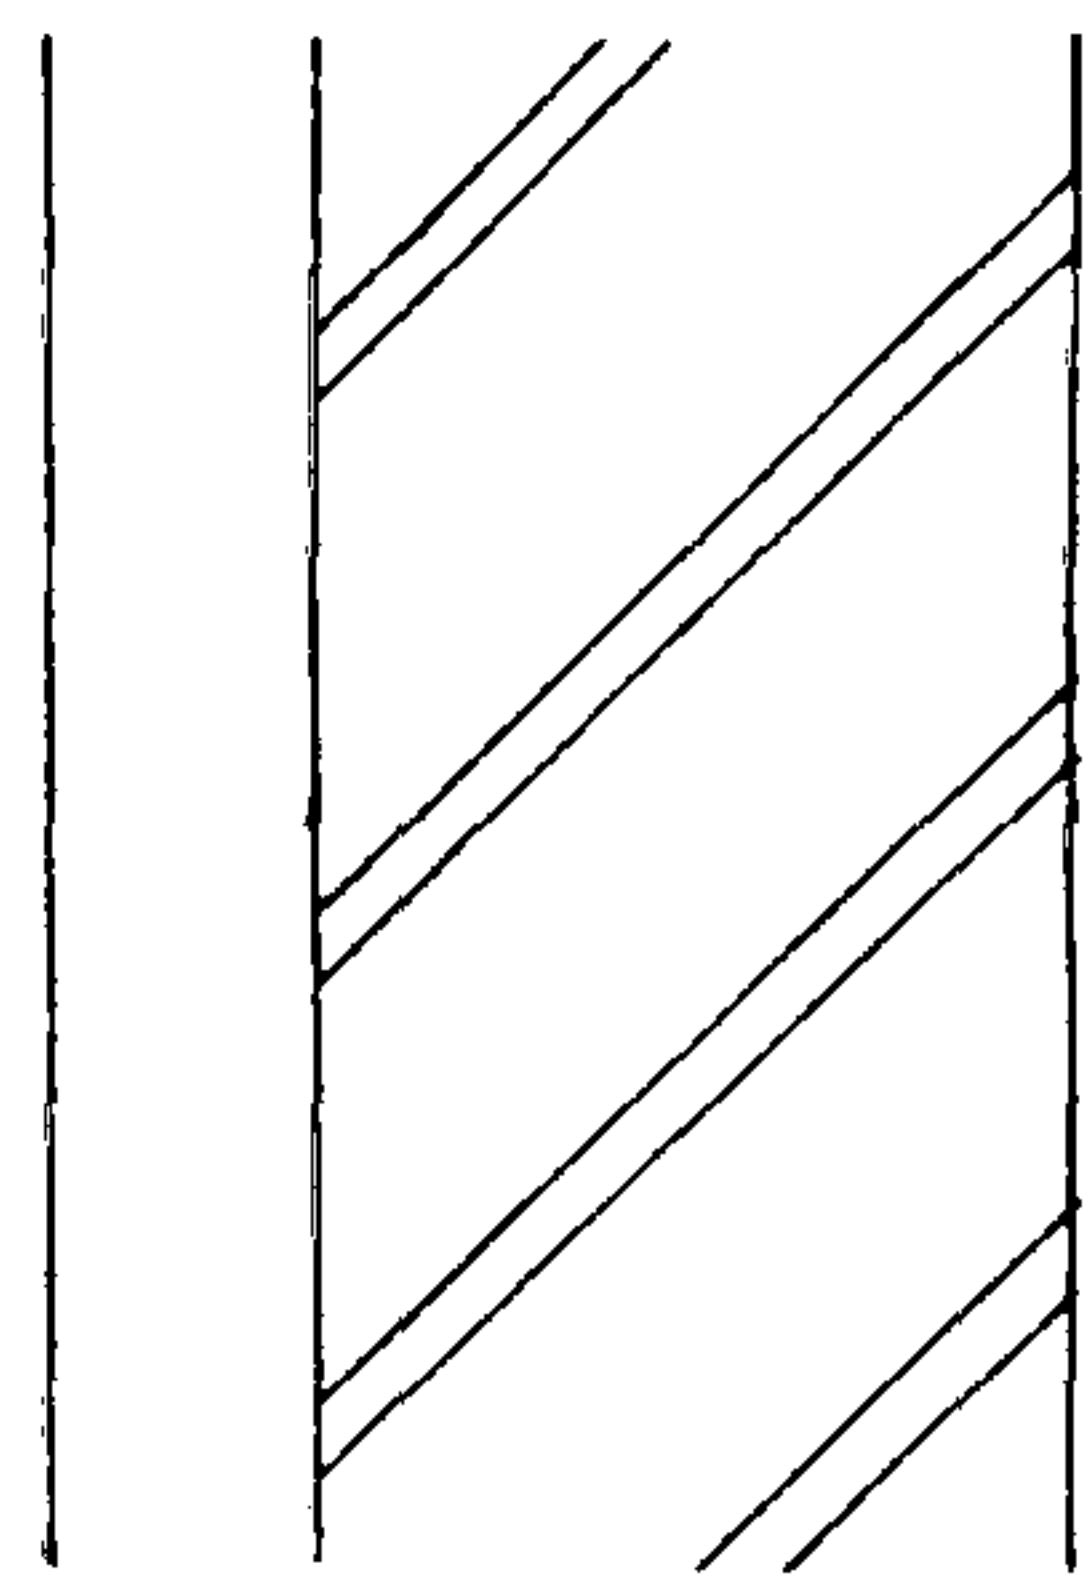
SOLID BRICK WALL: SINGLE GLAZED
